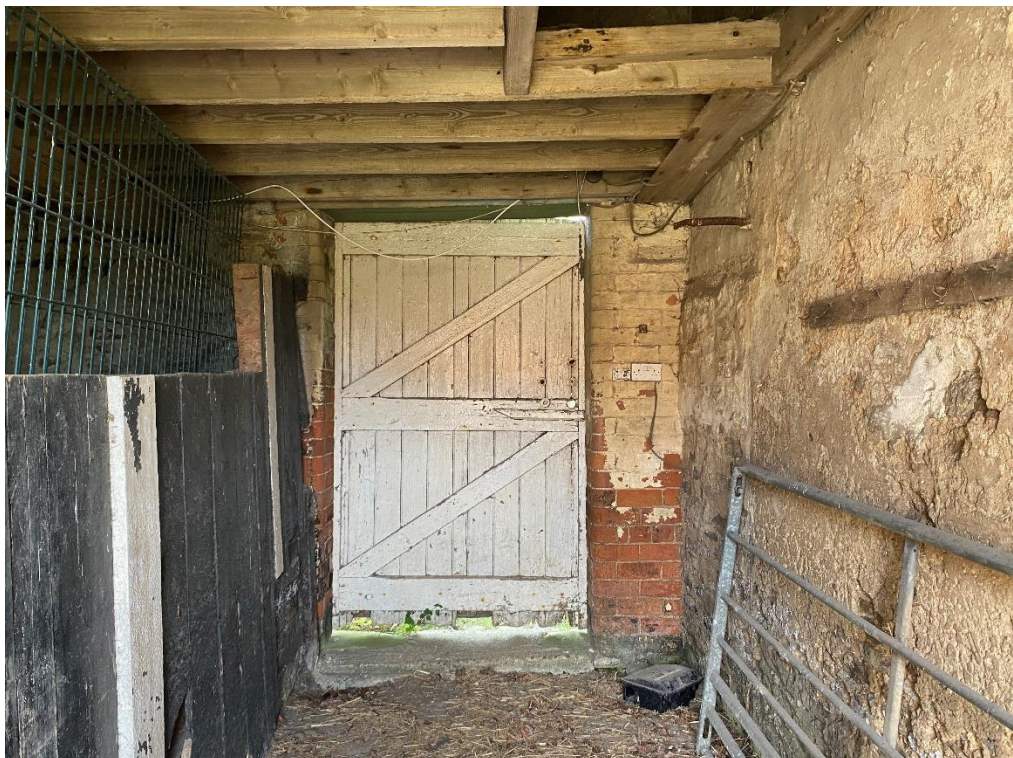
Building 3 - a small section of the ground floor is cobbled and the remainder of poor-quality concrete
